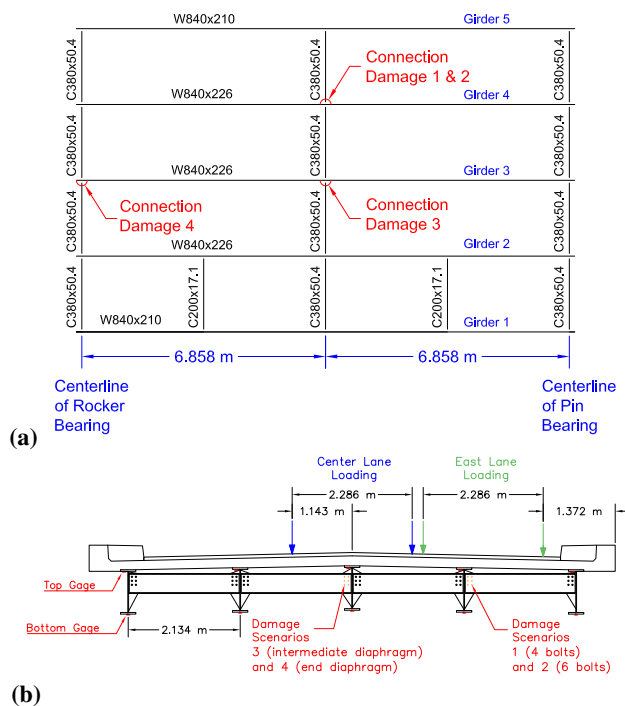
a Framing plan of structure with locations of prescribed damages denoted; b cross-section of the superstructure showing the locations of the BDI strain transducers, prescribed damage scenarios, and truck lanes
